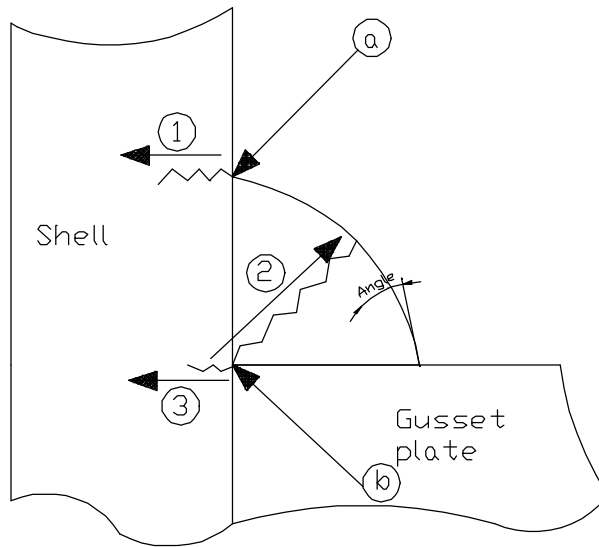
a Typical cracks at horizontal fillet welds at top of gusset plates to shell at chimney
